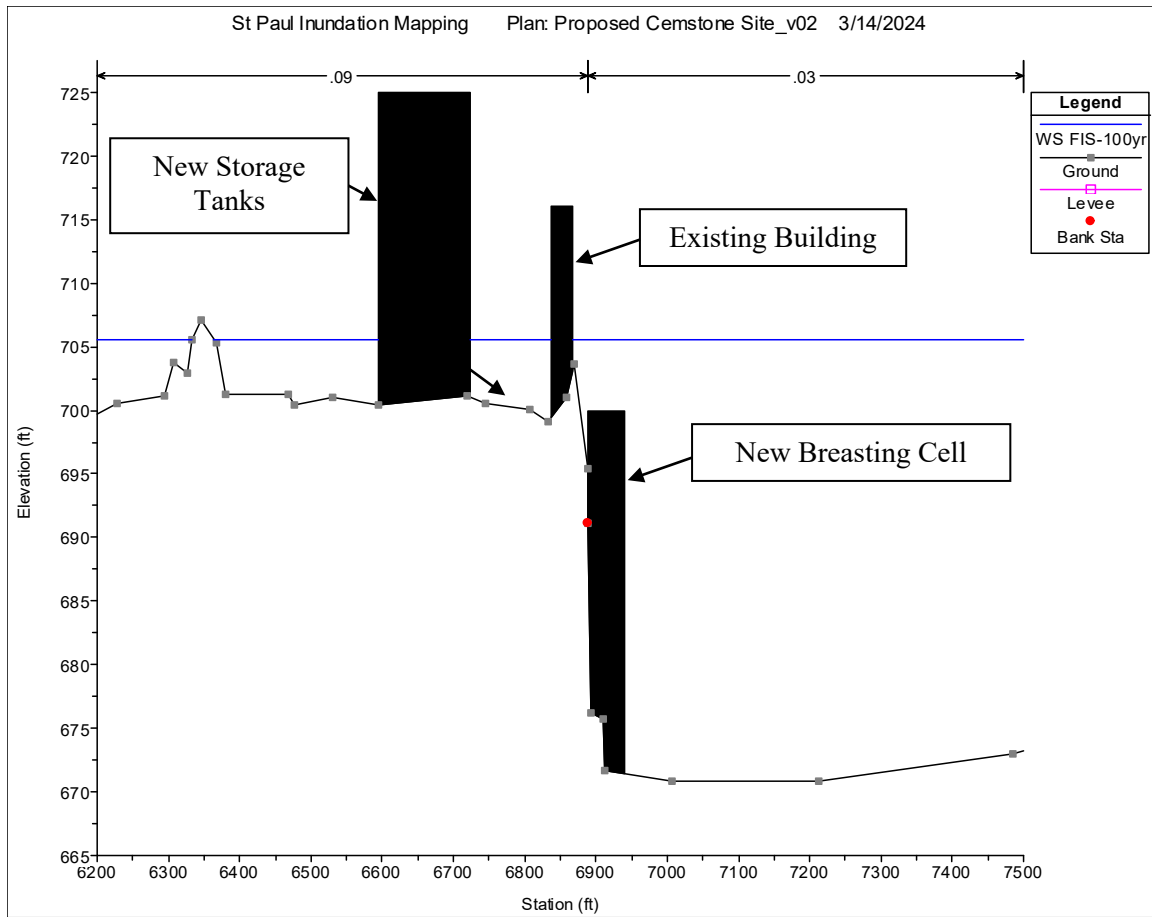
Proposed Conditions HEC-RAS Cross-Section of the Site.
